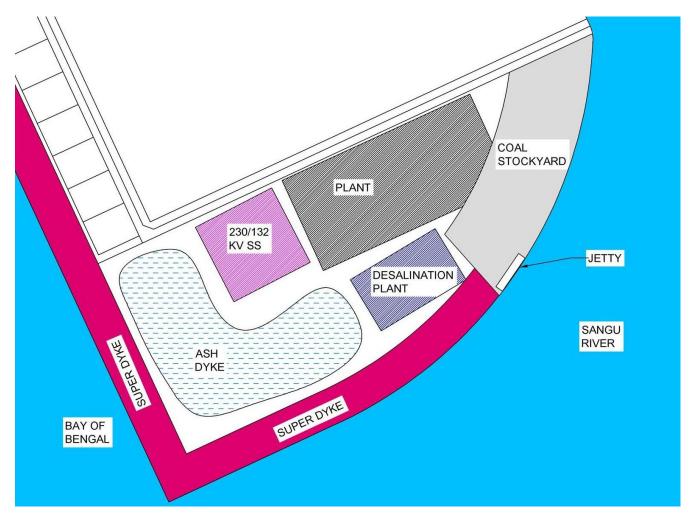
Typical Layout for Power Plant and Jetty
